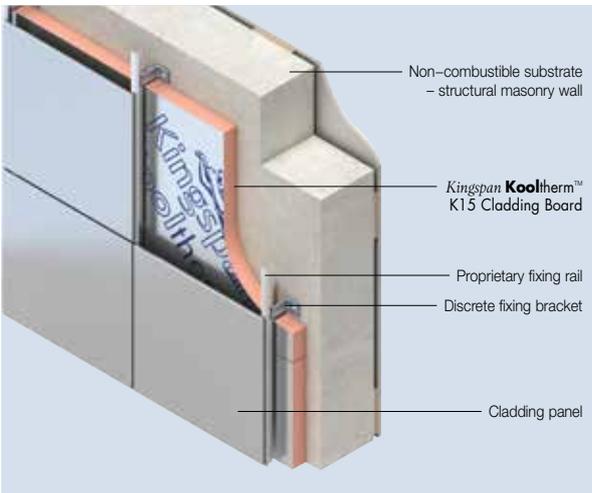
Insulated Cladding Systems on Solid Reinforced Concrete
